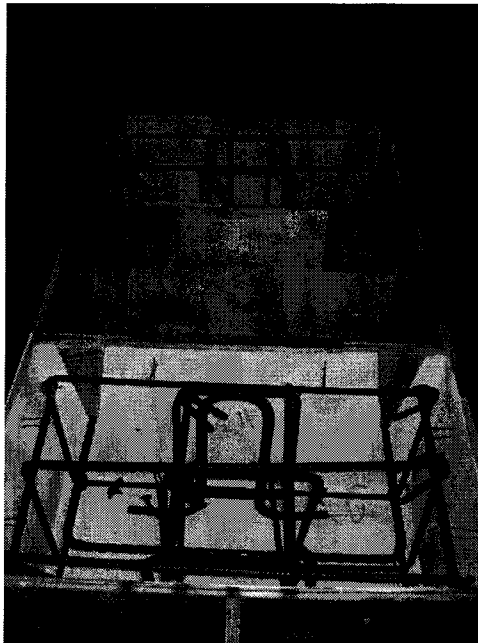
Wooden form and steel cage for bent bars and stirrups test
